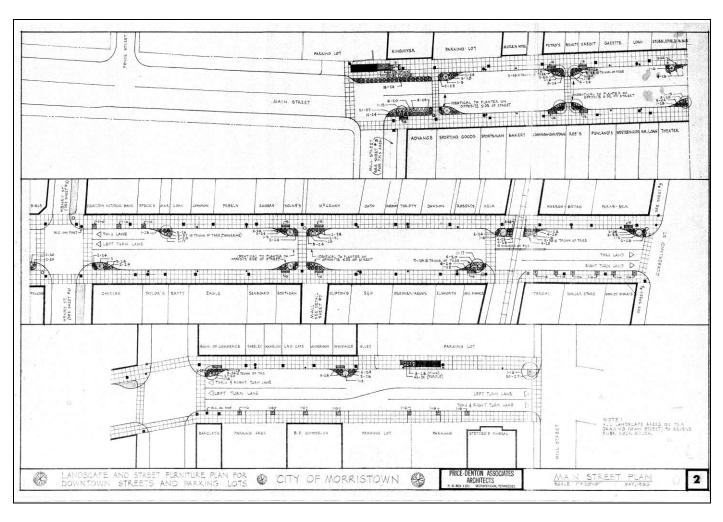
Landscape and street furniture plan for downtown streets and parking lots. May 1966 City of Morristown Main Street Plan designed by Price-Denton Architects. This was an early draft plan for the Main Street District and Skymart configuration. Westernmost and easternmost ends were constructed differently than this plan indicates. Side legs on north-south streets (pedestrian access points) not shown, including ramps along Cumberland Street.
